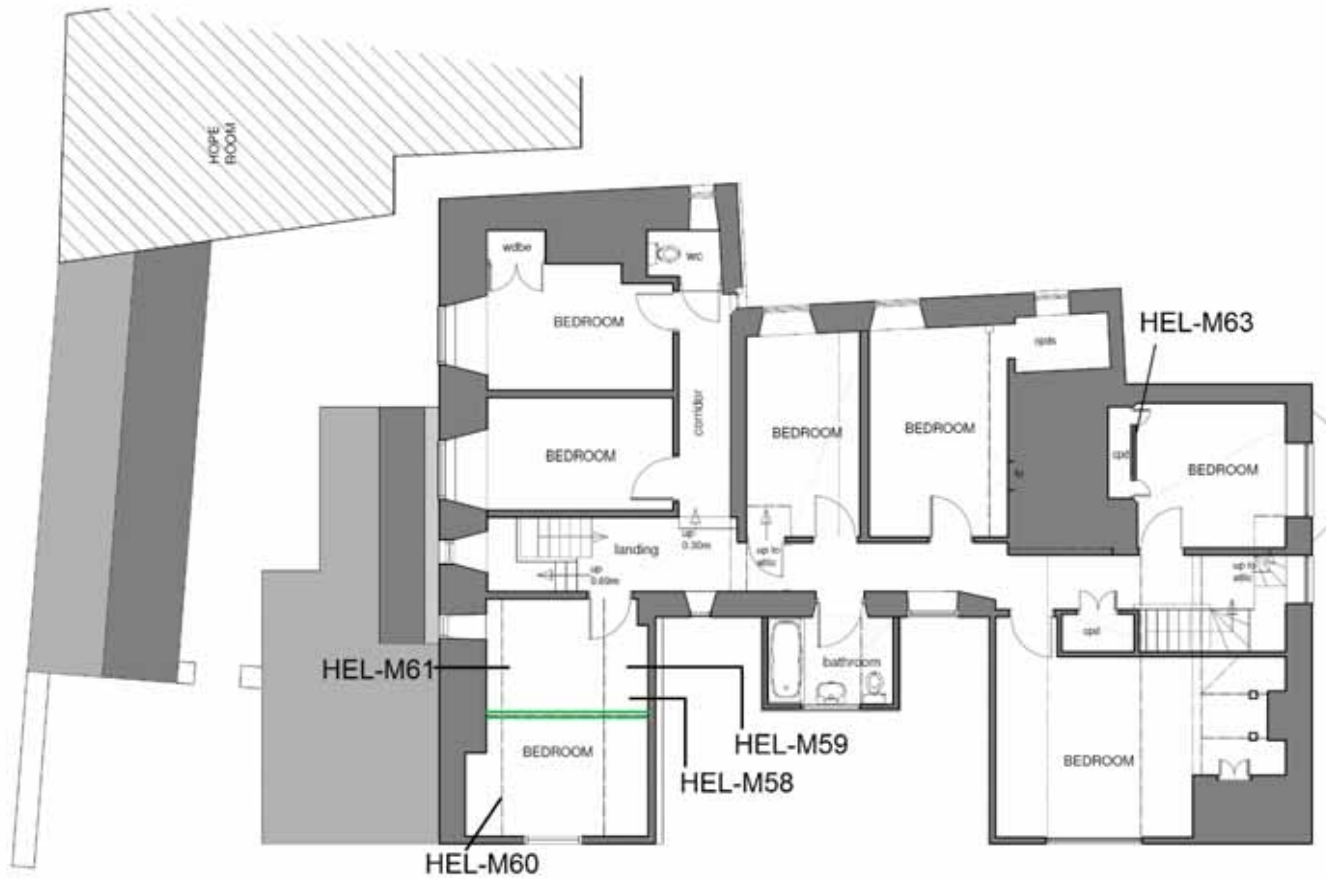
First-floor plan, showing the location of samples HEL-M58–61 and HEL-M63 (Malcolm Tempest)
